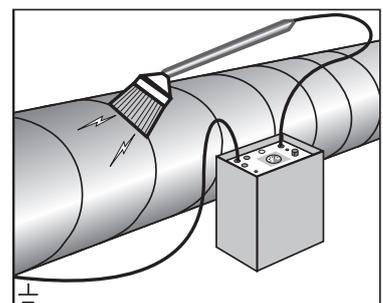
Perform a holiday test using a ring or brass brush (refer to the table for holiday detection voltages).
